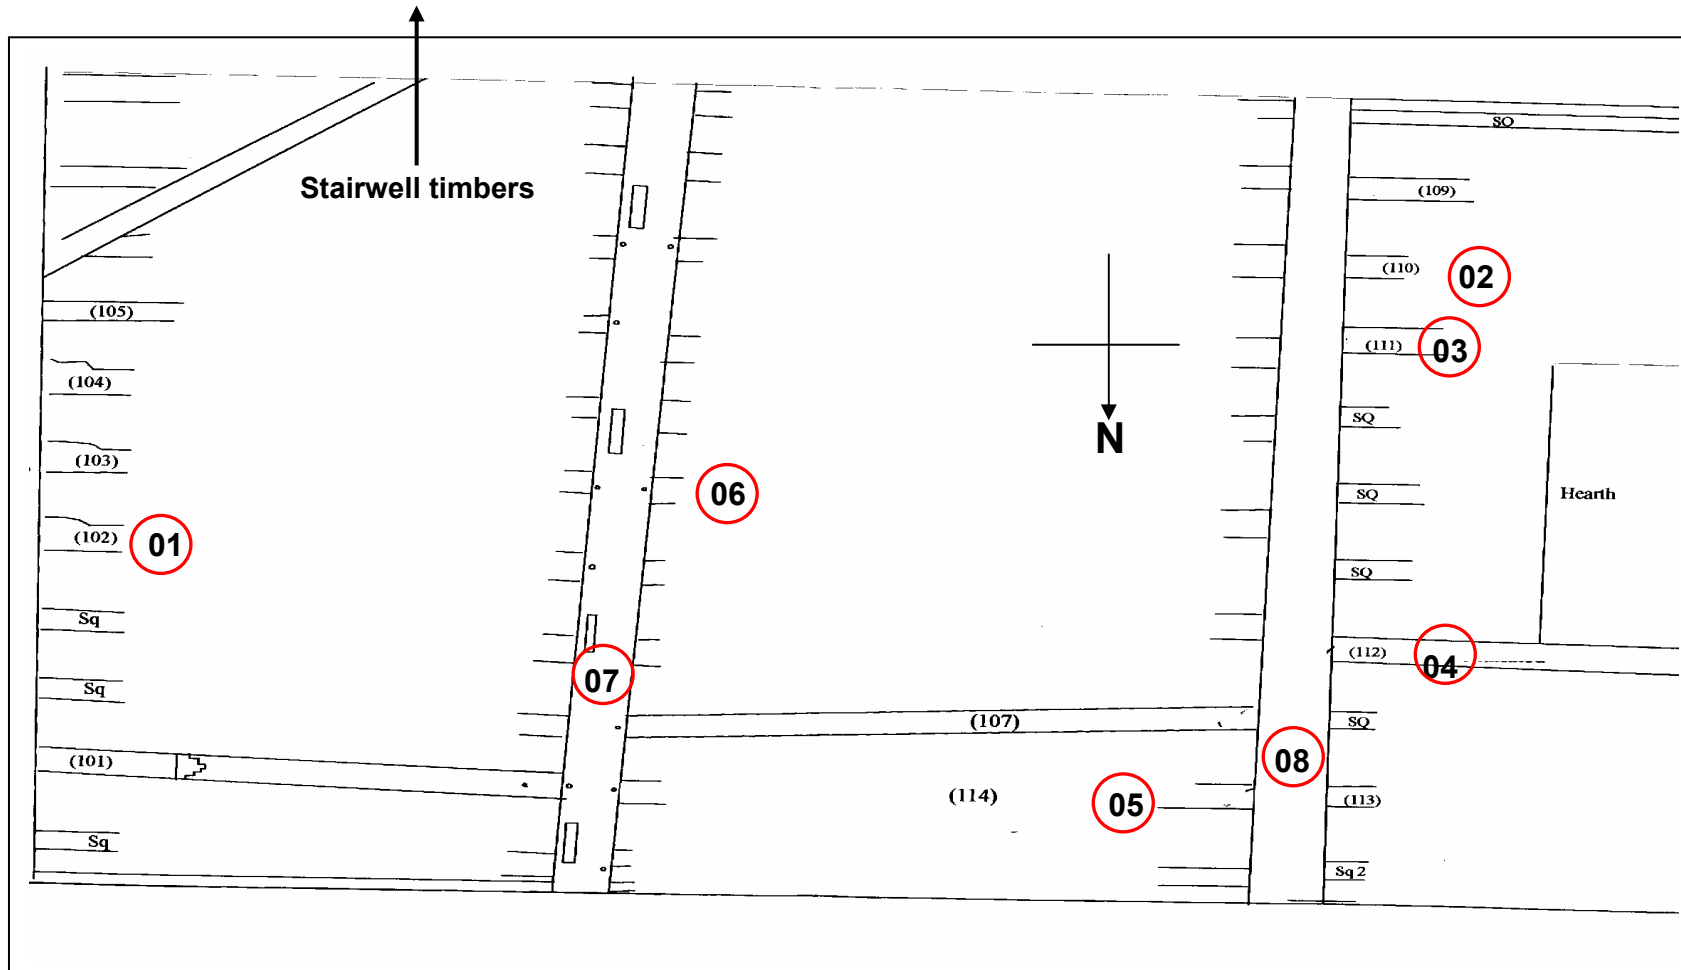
General plan to show position of samples from the front room floor (after Mike Napthan)
